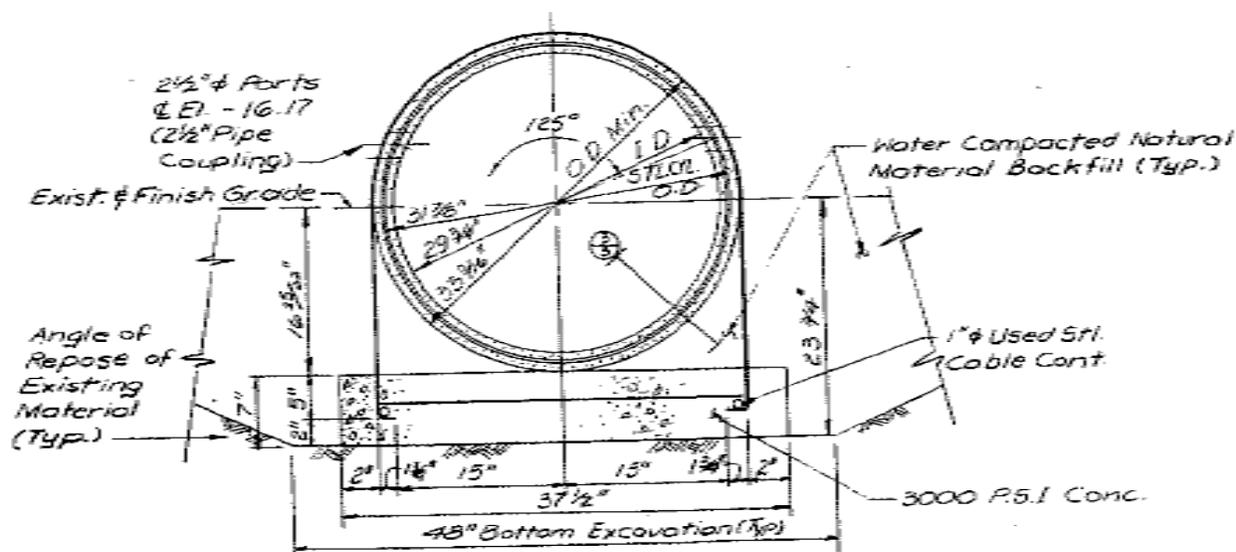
Outfall 001 diffuser cross-section drawing. Source: CDM (1979). "Drawing M-3, Effluent Outfall Diffuser Section Details and Trench Sections".
